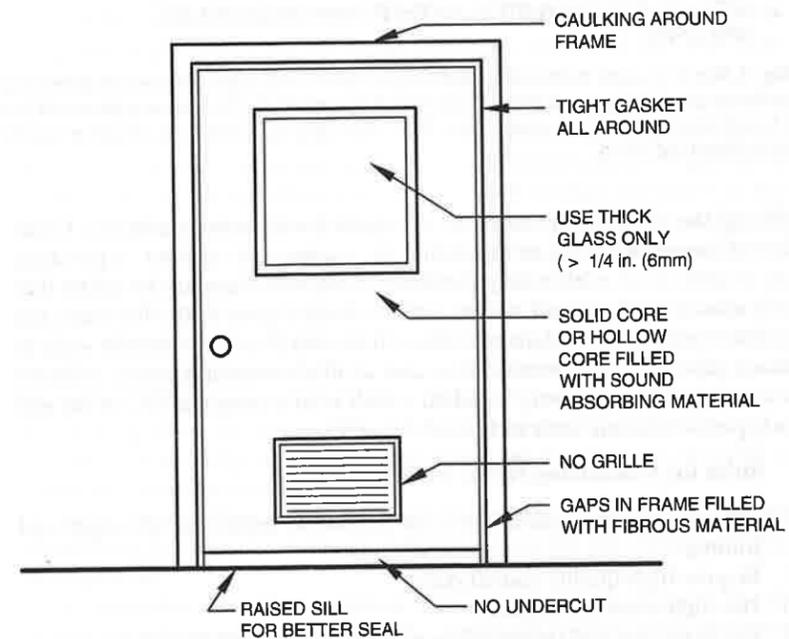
Because doors are potential weak areas in preventing sound transmission through a wall, they have to be carefully designed, specified, and constructed.
